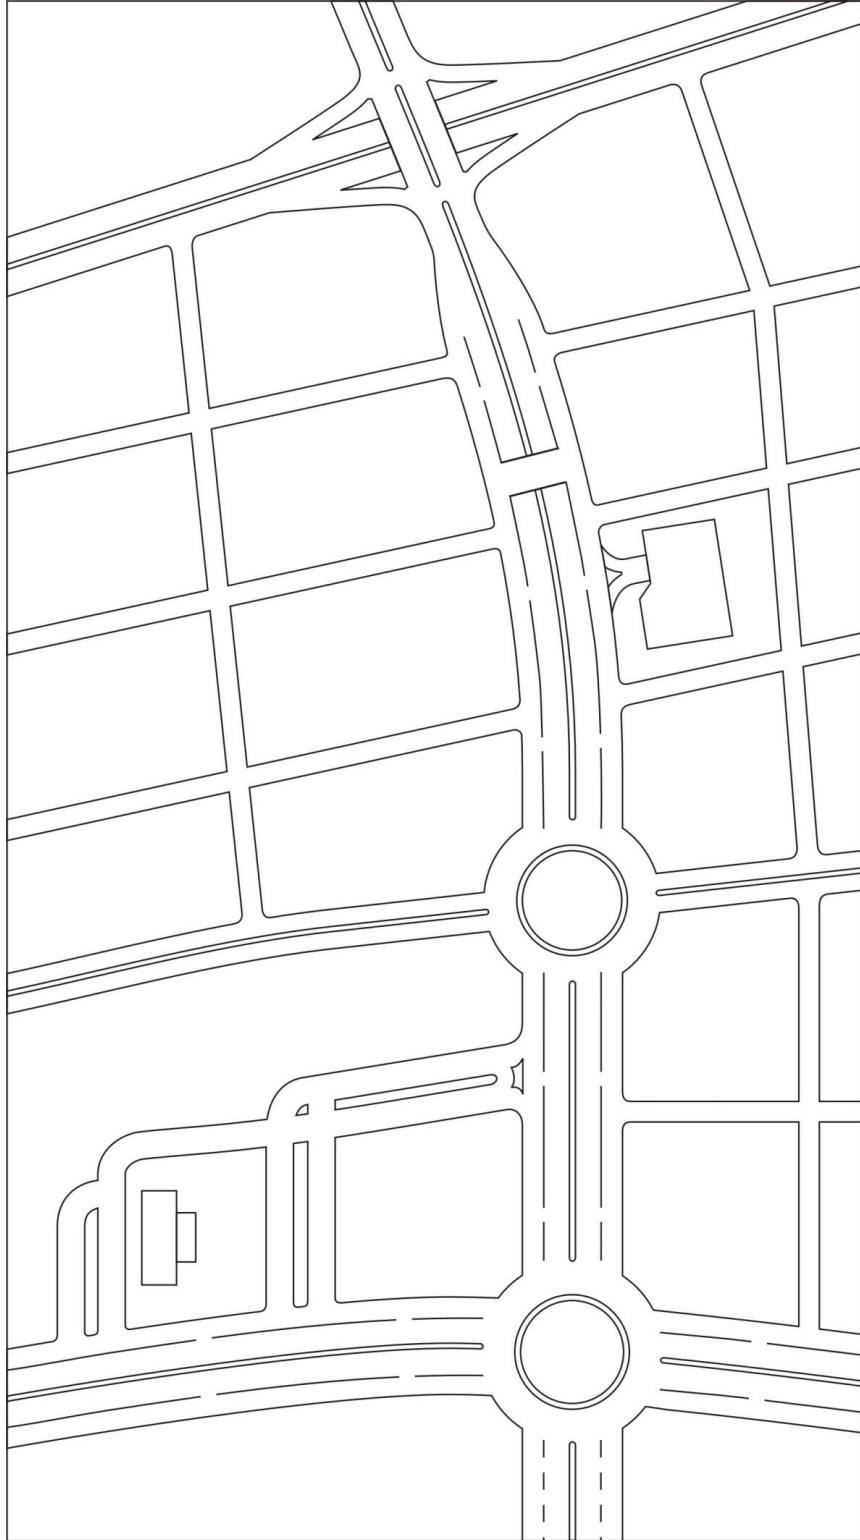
Geometrical design of proposition 1 (tunnel and two roundabout)
